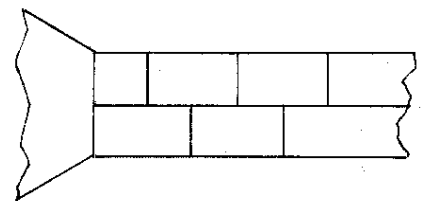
Staggered end joints will minimize the likelihood of stress cracks in the future
